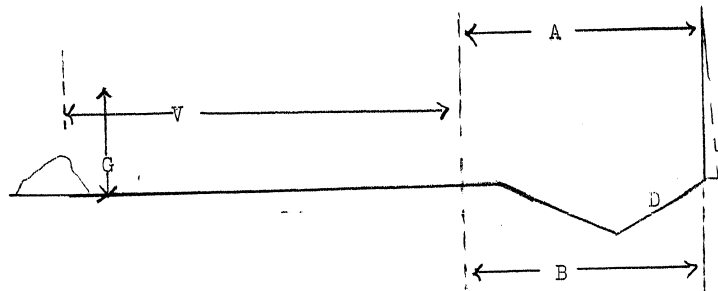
Operating plan for digging a foundation pit with earth removal by truck.
